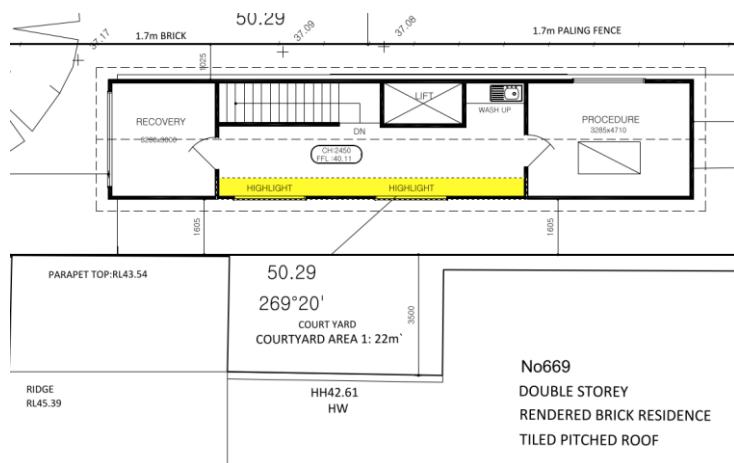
Extract of the advertised First Floor Plan showing increased setback highlighted yellow.
